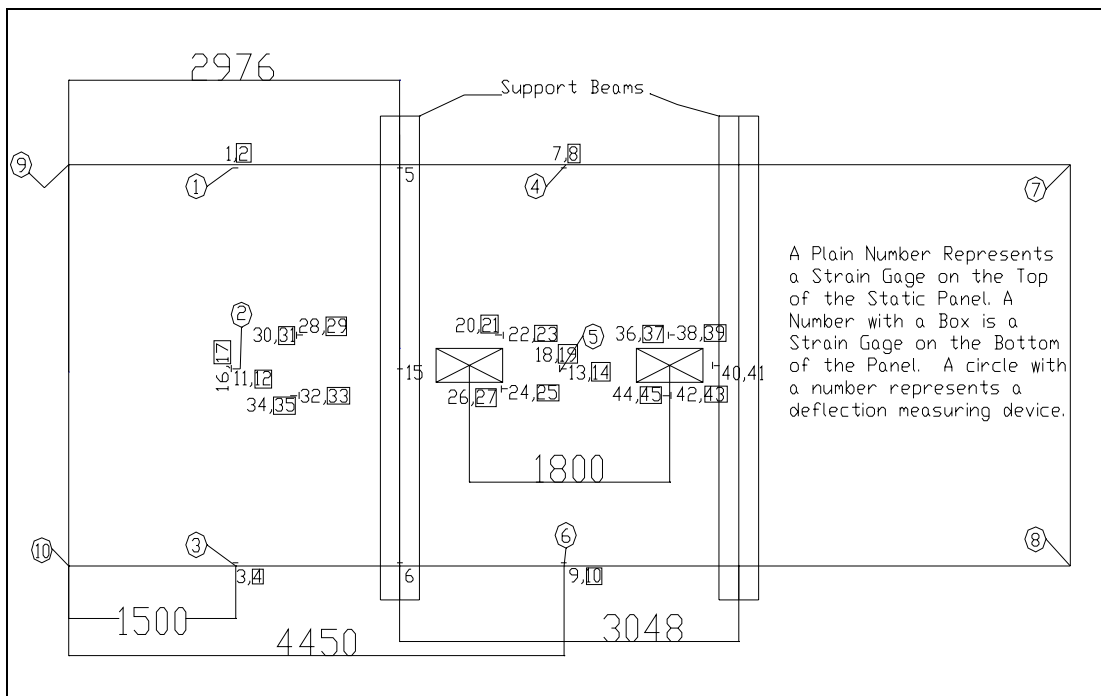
LOAD POSITIONS AND INSTRUMENTATION FOR STATIC TEST E1-B
